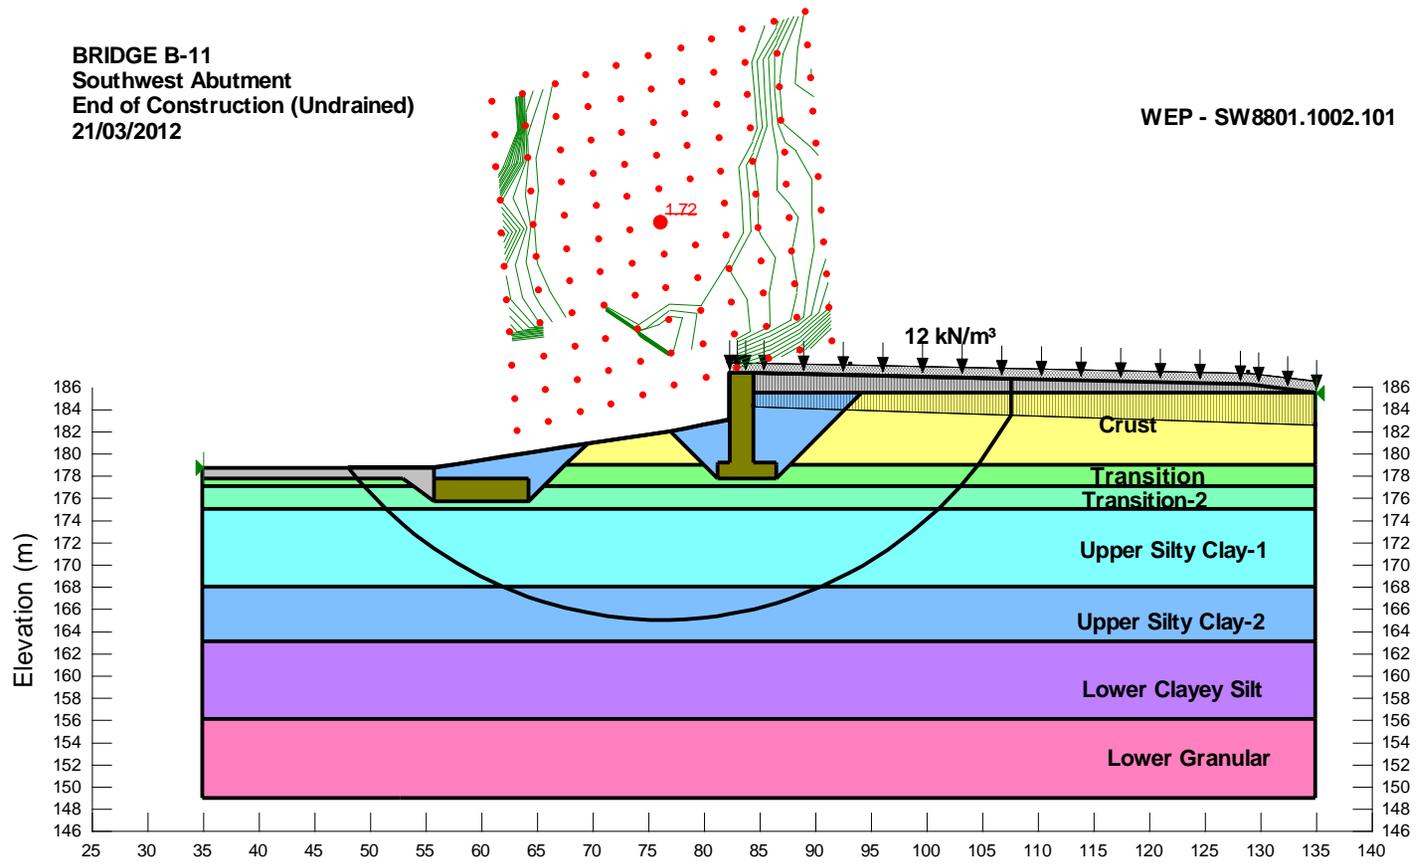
Global Stability Result – Southwest Abutment – Short-Term Loading (Undrained properties)
